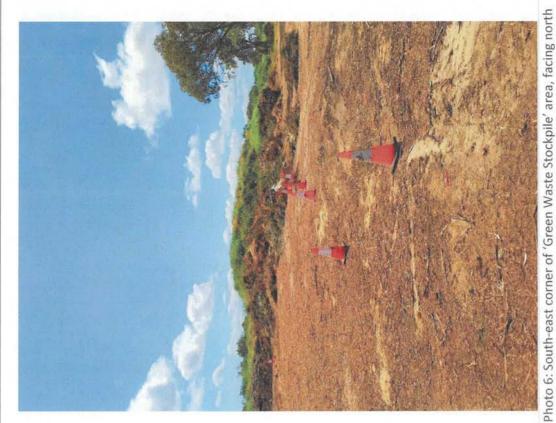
South-east corner of 'Green Waste Stockpile' area, facing north-
